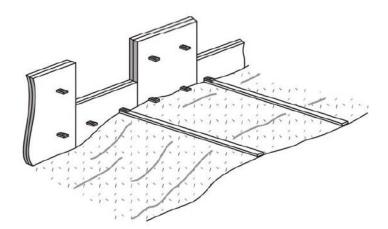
Elemental system showing concrete facing with strip reinforcement (Jones, 2002)
